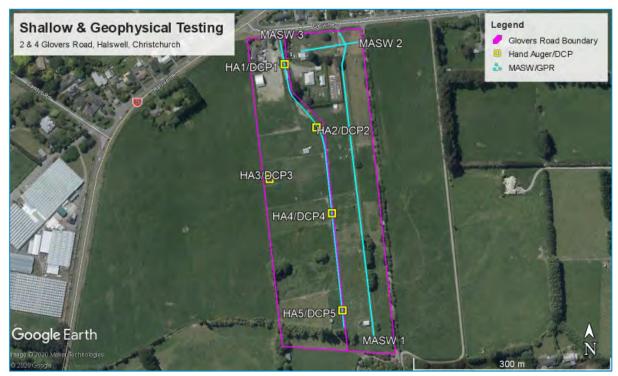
Other Geotechnical Investigation Location Plan (Scale as Shown)
